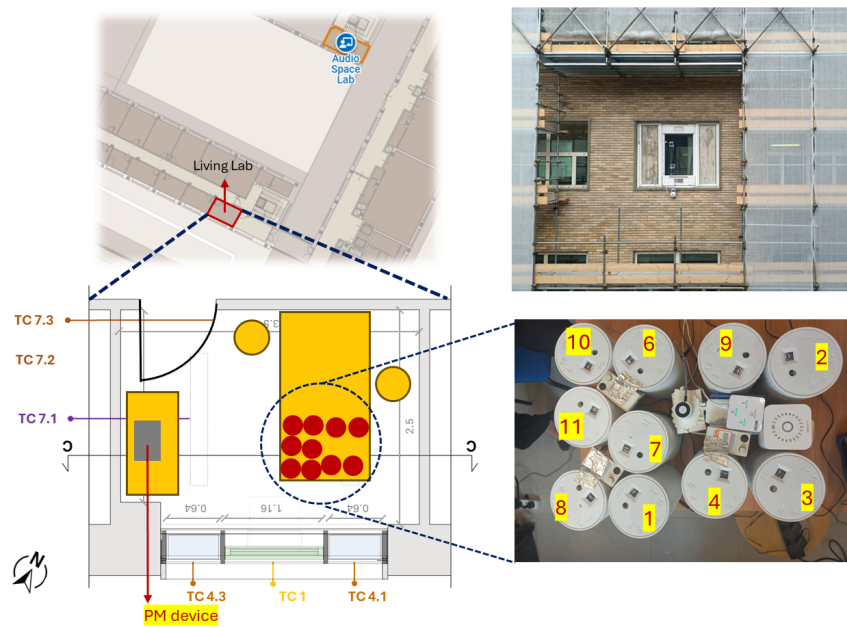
Living Lab Plan with Sensor Positioning Day 1
